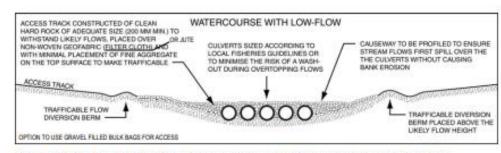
Typical profile of temporary culvert crossing (cross-section)
